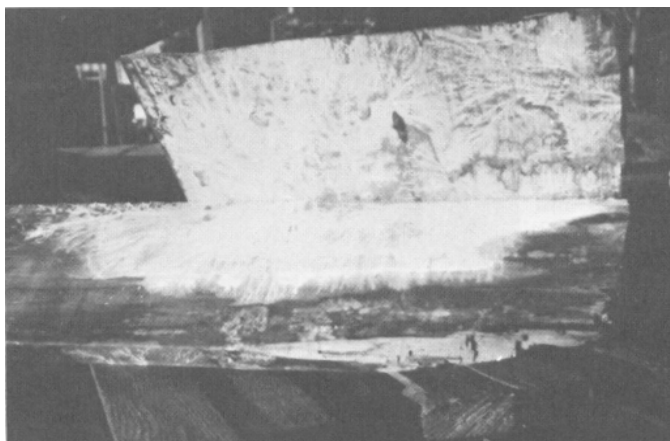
Mycelial mat on joist and underside of plywood subfloor.
